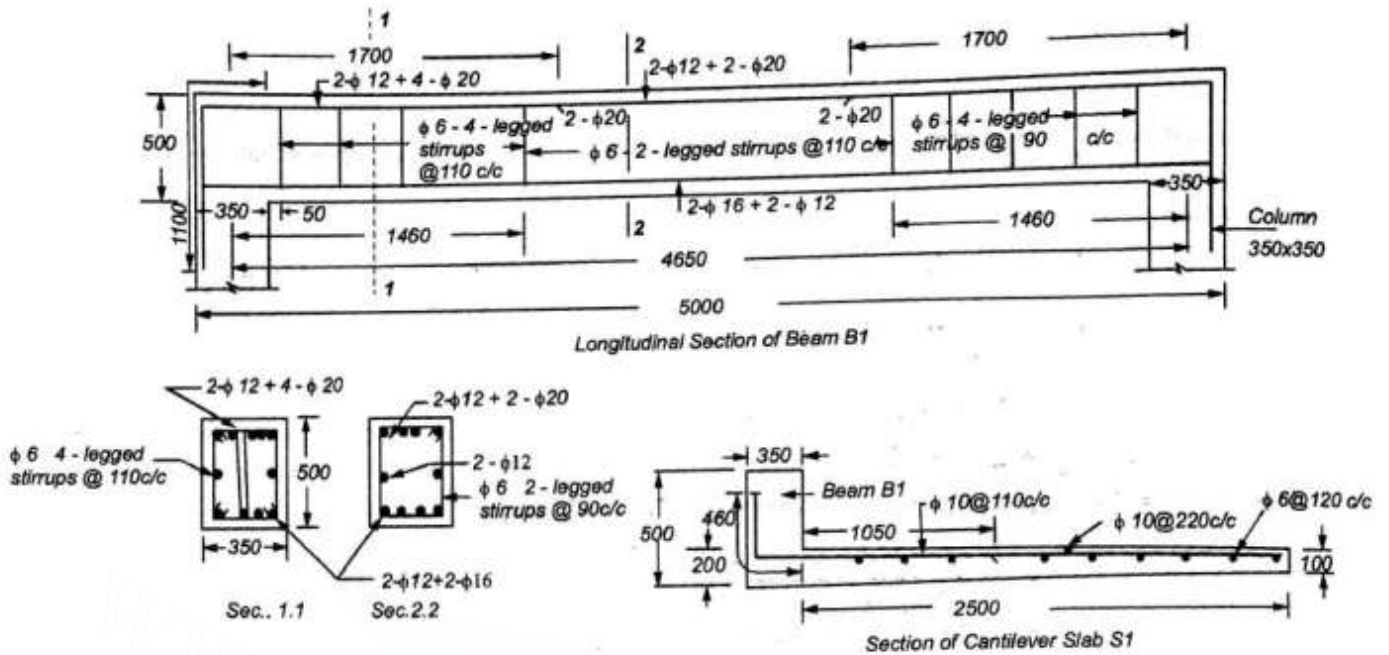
Reinforcement Details of Cantilever Porch and Supporting Beam
